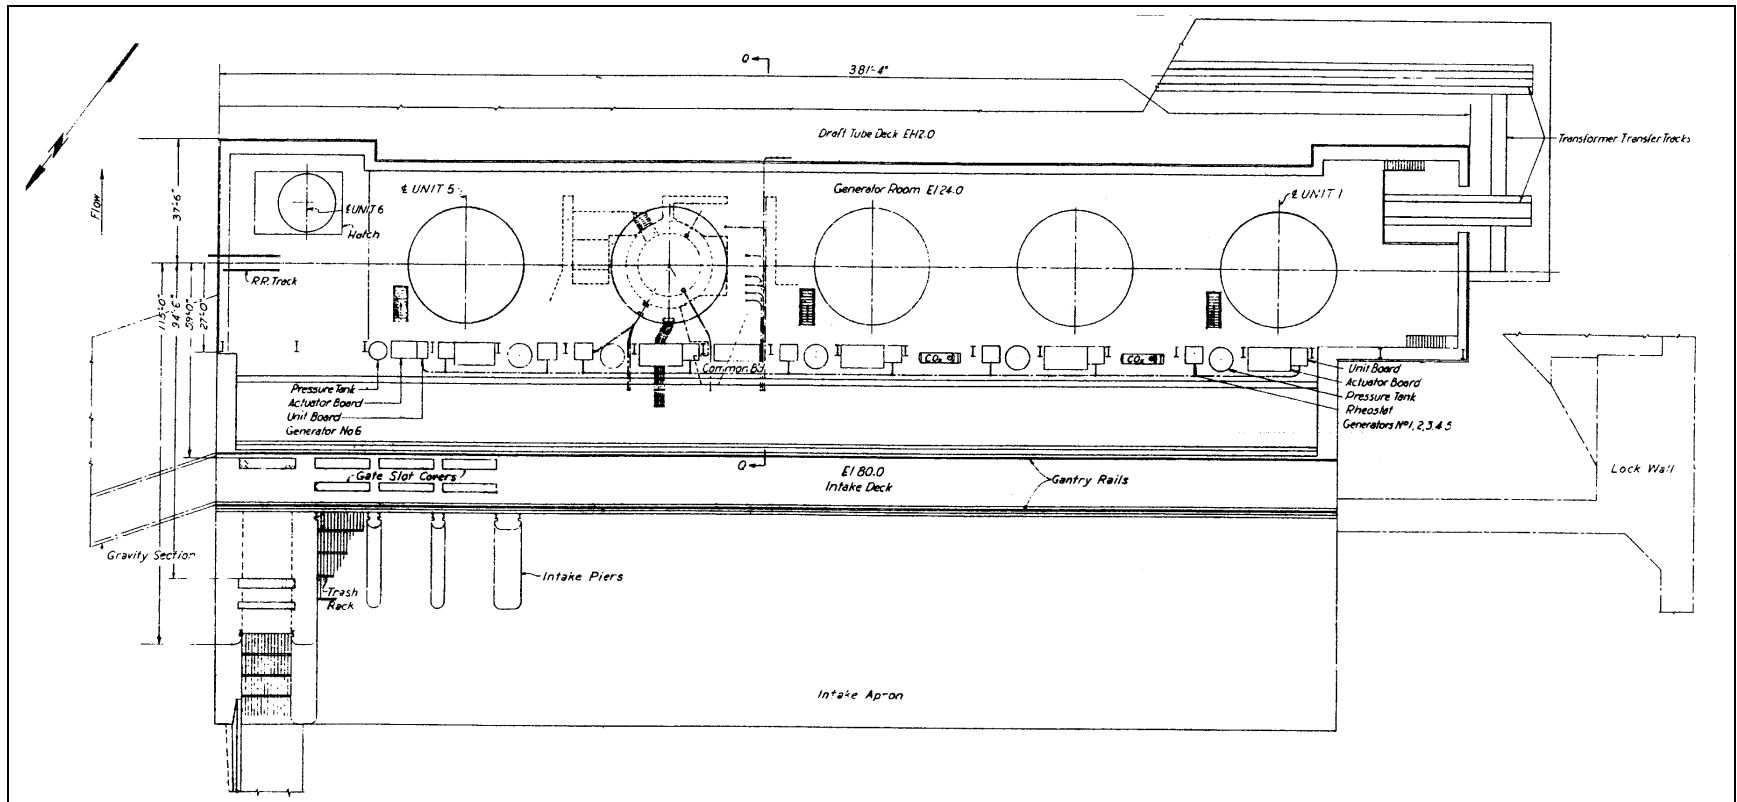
Plan view of the Jefferies Powerhouse. Drawing provided by Santee Cooper.
